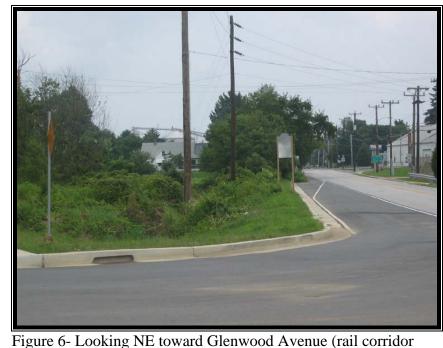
Looking NE toward Glenwood Avenue (rail corridor alignment and Greens Branch on north side of Smyrna-Clayton Boulevard)
